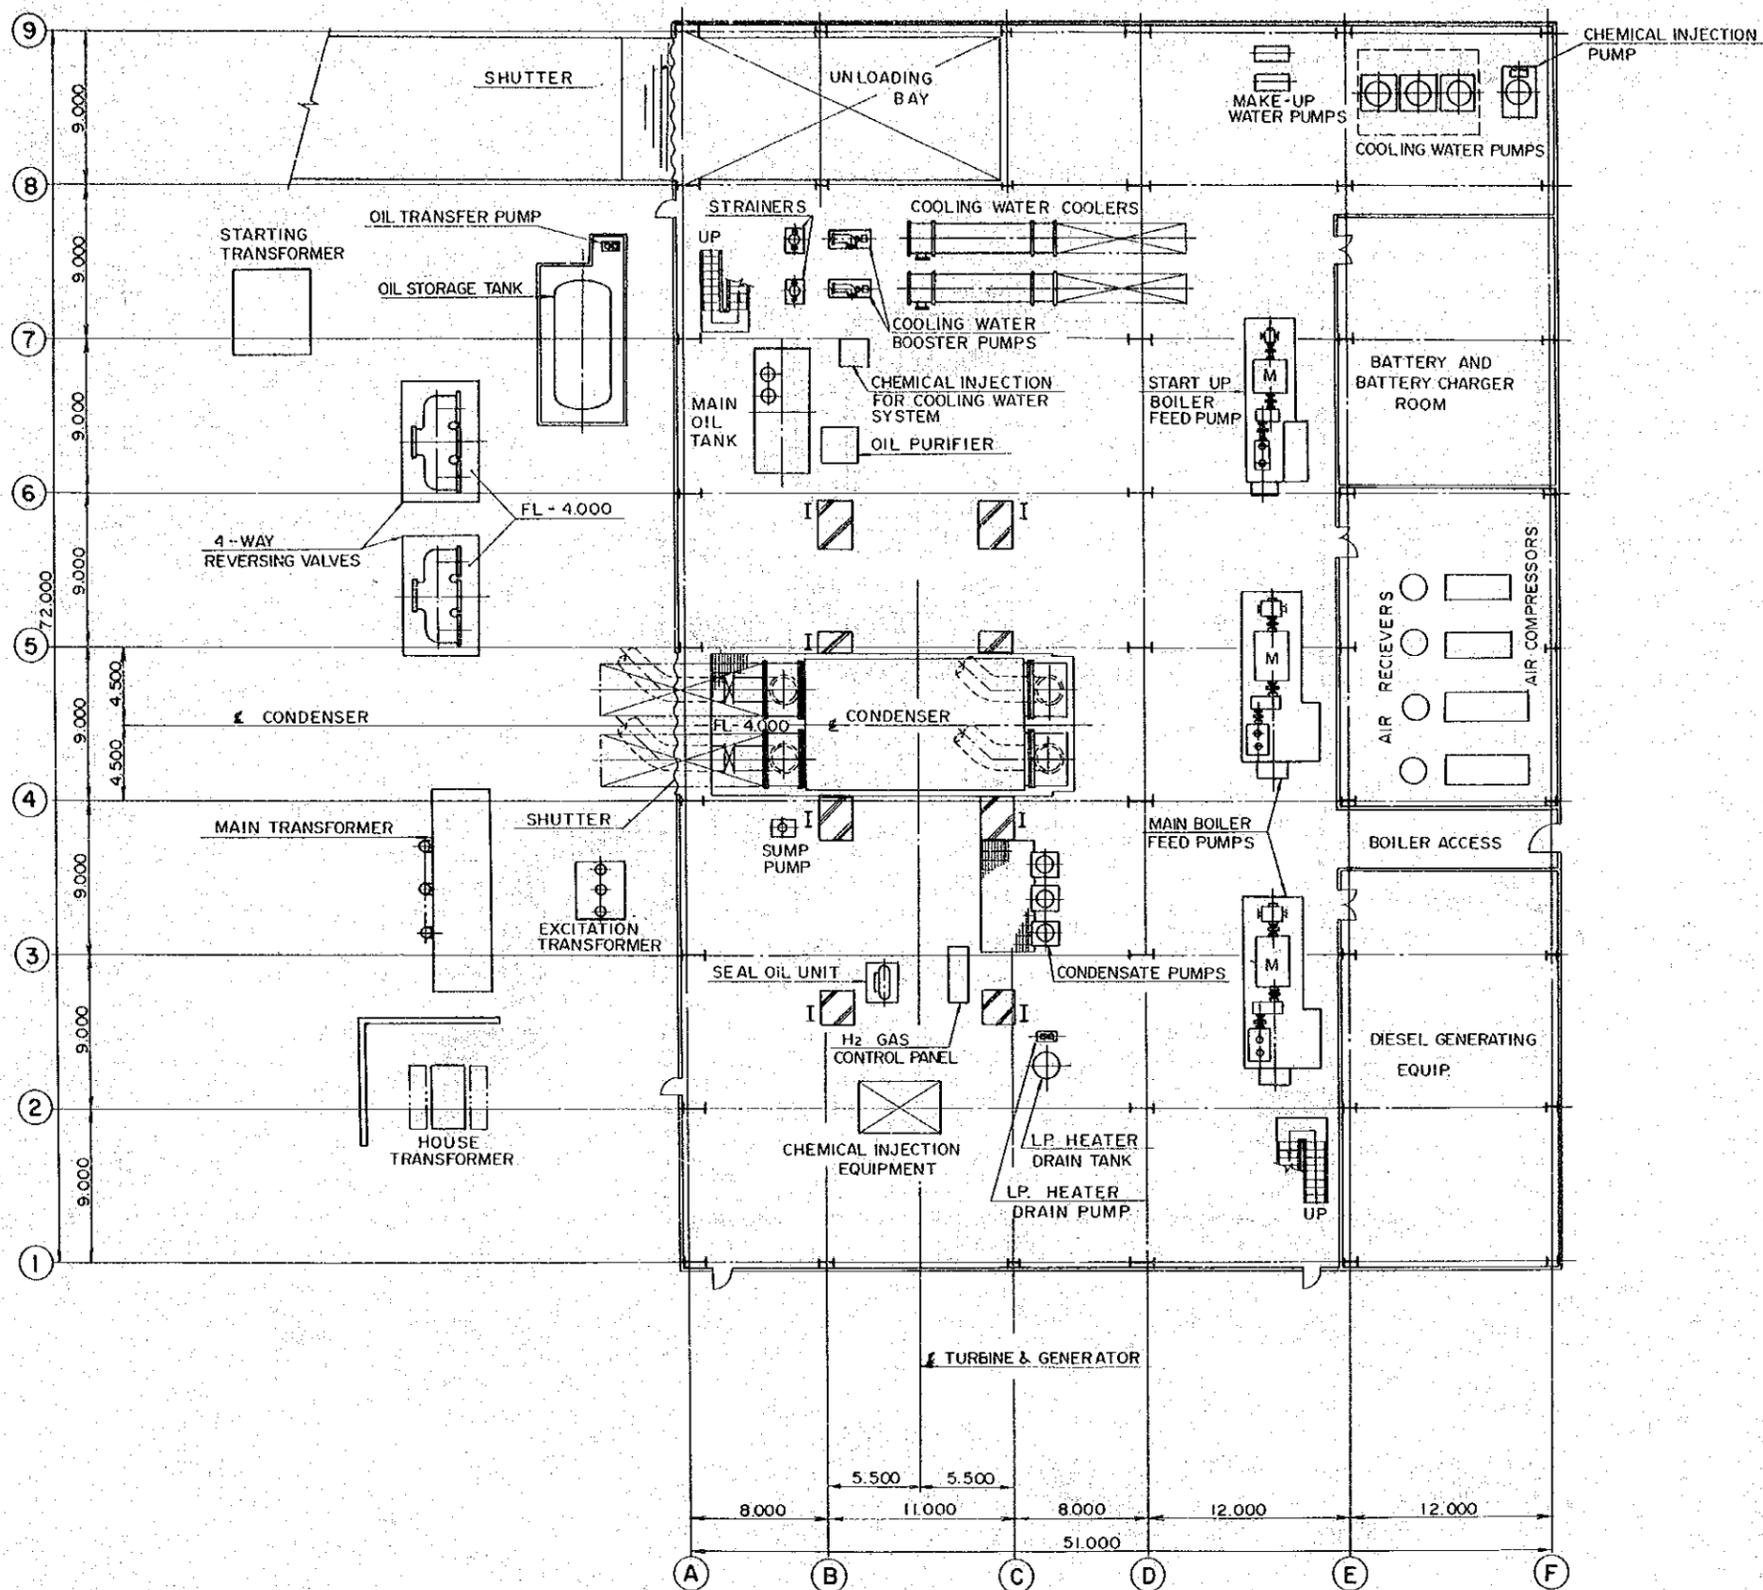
MEZZANING FLOOR PLAN (300MW)
